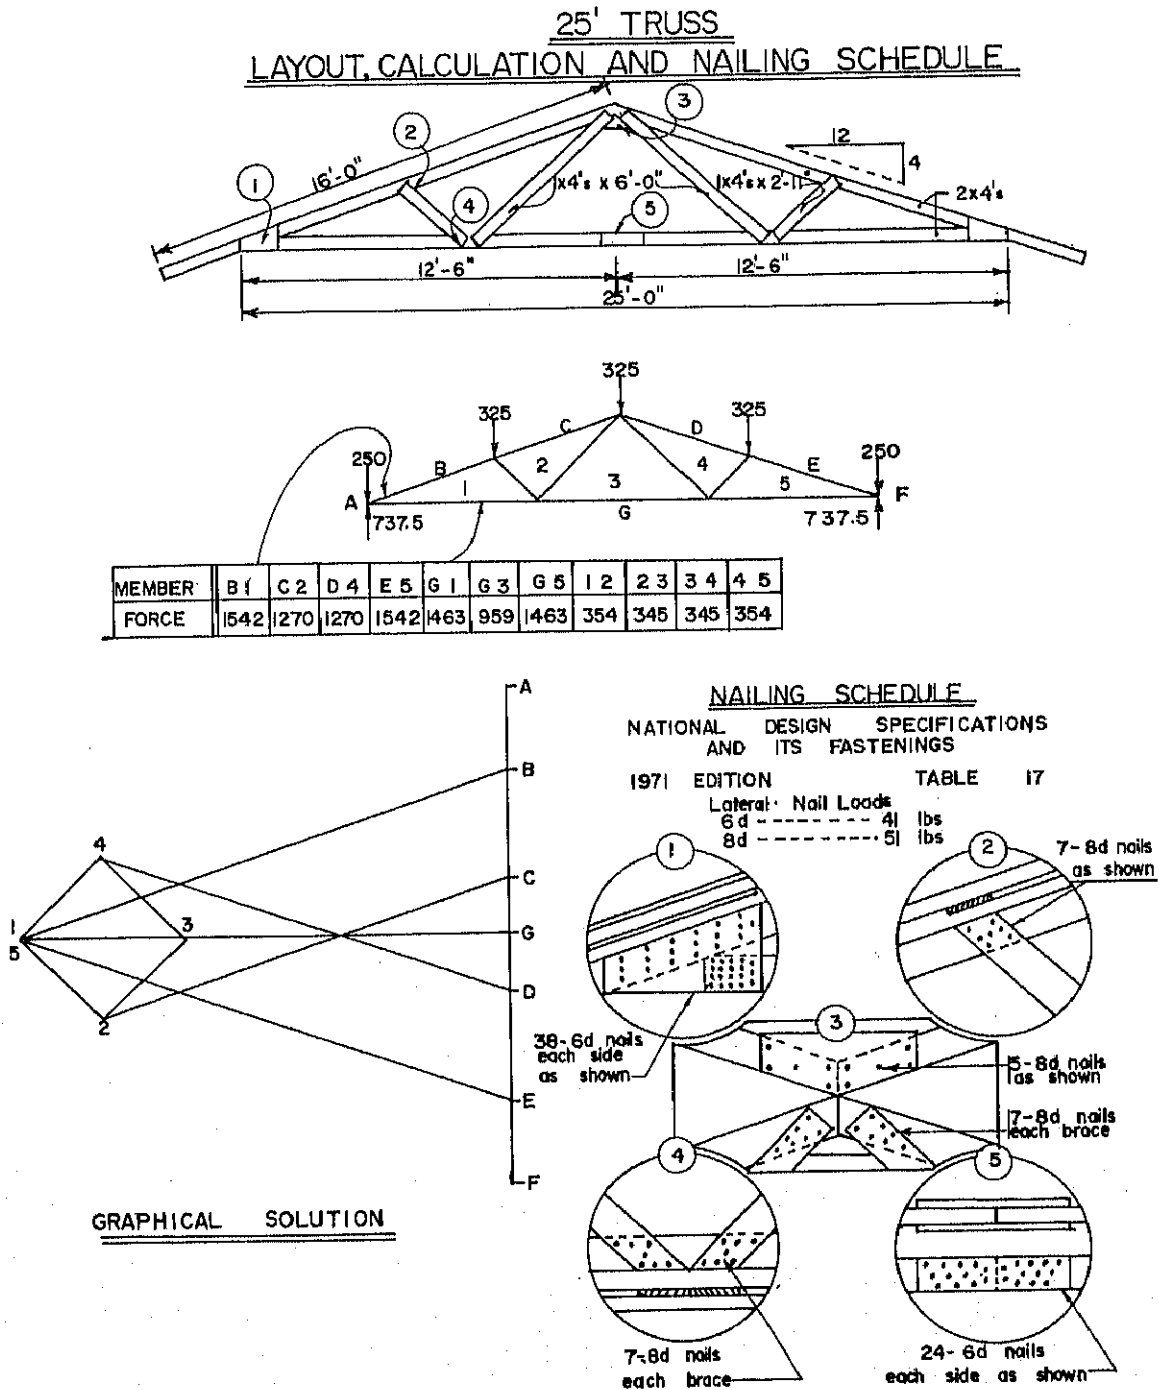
Layout, load calculations, and nailing schedule for 25' 0" lightweight truss.
